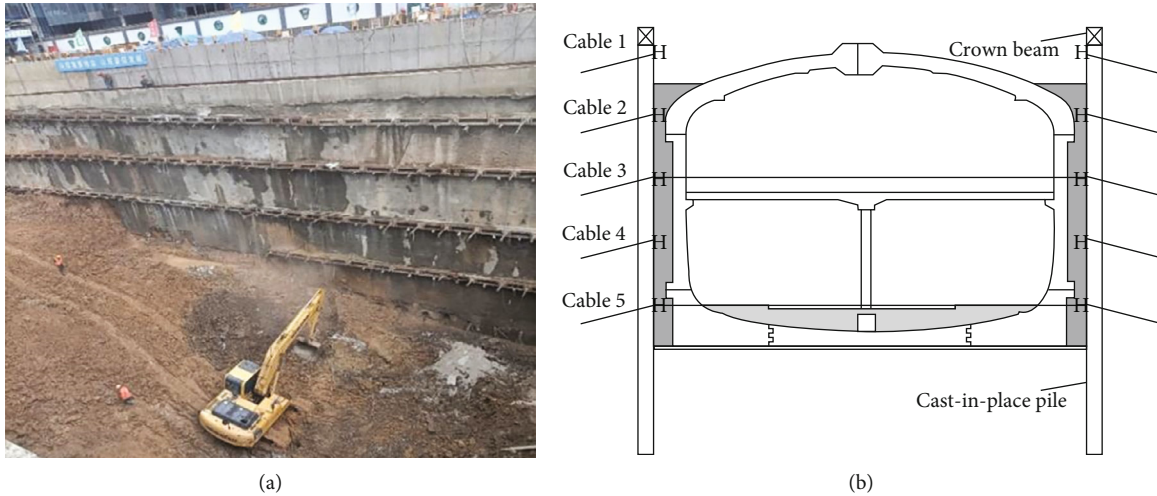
Project overview: (a) construction site and (b) structural profile [19].
